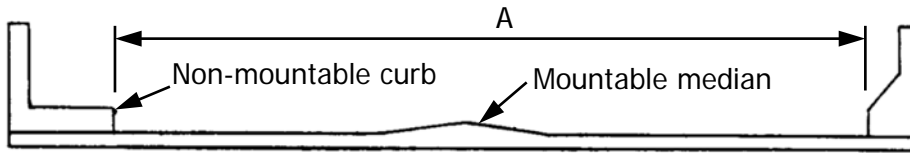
Cross-section view of a highway feature carried on the bridge with a mountable median.
